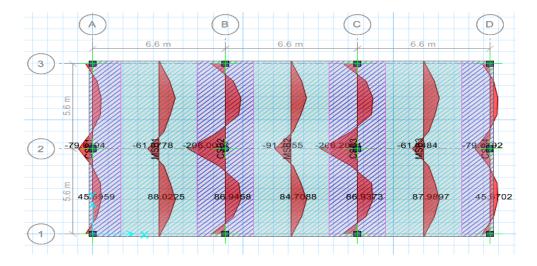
C.S& M.S along shorter direction(SAFE:EC2, without staggered column)
